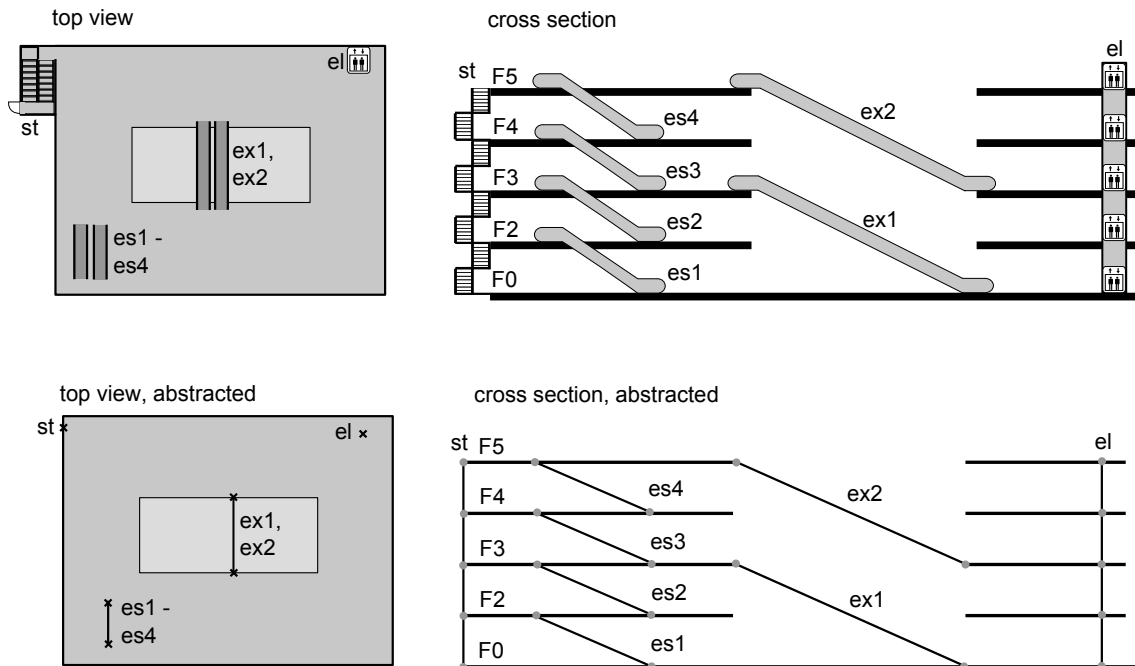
Top view and cross section of a building with escalators and an elevator. While the building would intuitively be considered a 3D object, each floor can be treated as a 2D area, if we are, e.g., only interested in navigating the building for which room heights are usually irrelevant (as long as they are assumed to be of sufficient height). Escalators (*es1*–*es4* and *ex1*, *ex2*), elevators (*el*), and staircases (*st*) could be treated as line segments as long as it is clear that, e.g., a person can navigate those lines (as we usually assume a person or a car can navigate “lines” denoting streets on a map). Each floor would then, for example, have various points from which it is possible to access other floors. For many tasks, in particular navigation, such a simplified view would be sufficient. The bottom row shows the same views in an abstract way. While the building may be considered a 3D entity (not visible), the floors are 2D areas, connected by one-dimensional line segments, which are abstractions of staircases, escalators, and elevators. They connect floors and have access points (the point where they meet the floor). This abstract representation is perfectly fine to solve any coarse navigational tasks, e.g., how to get from one point to another point in the building or how to evacuate the building in the case of an emergency.
